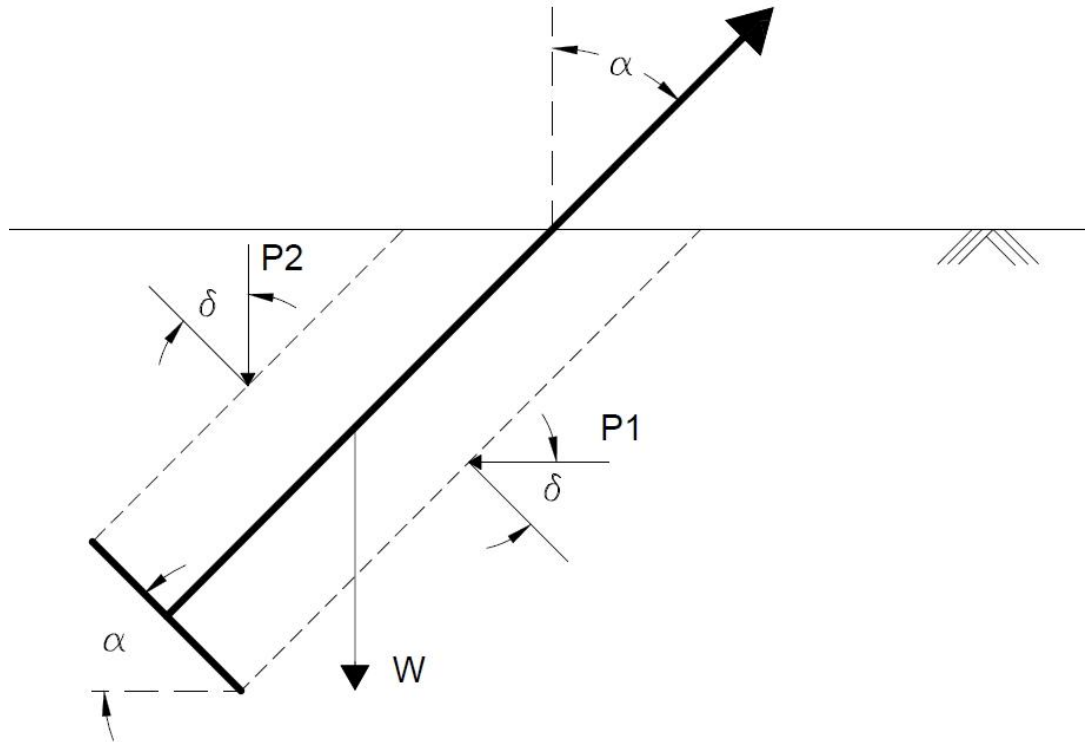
Failure planes (adapted from: Hanna et al., 1988)
